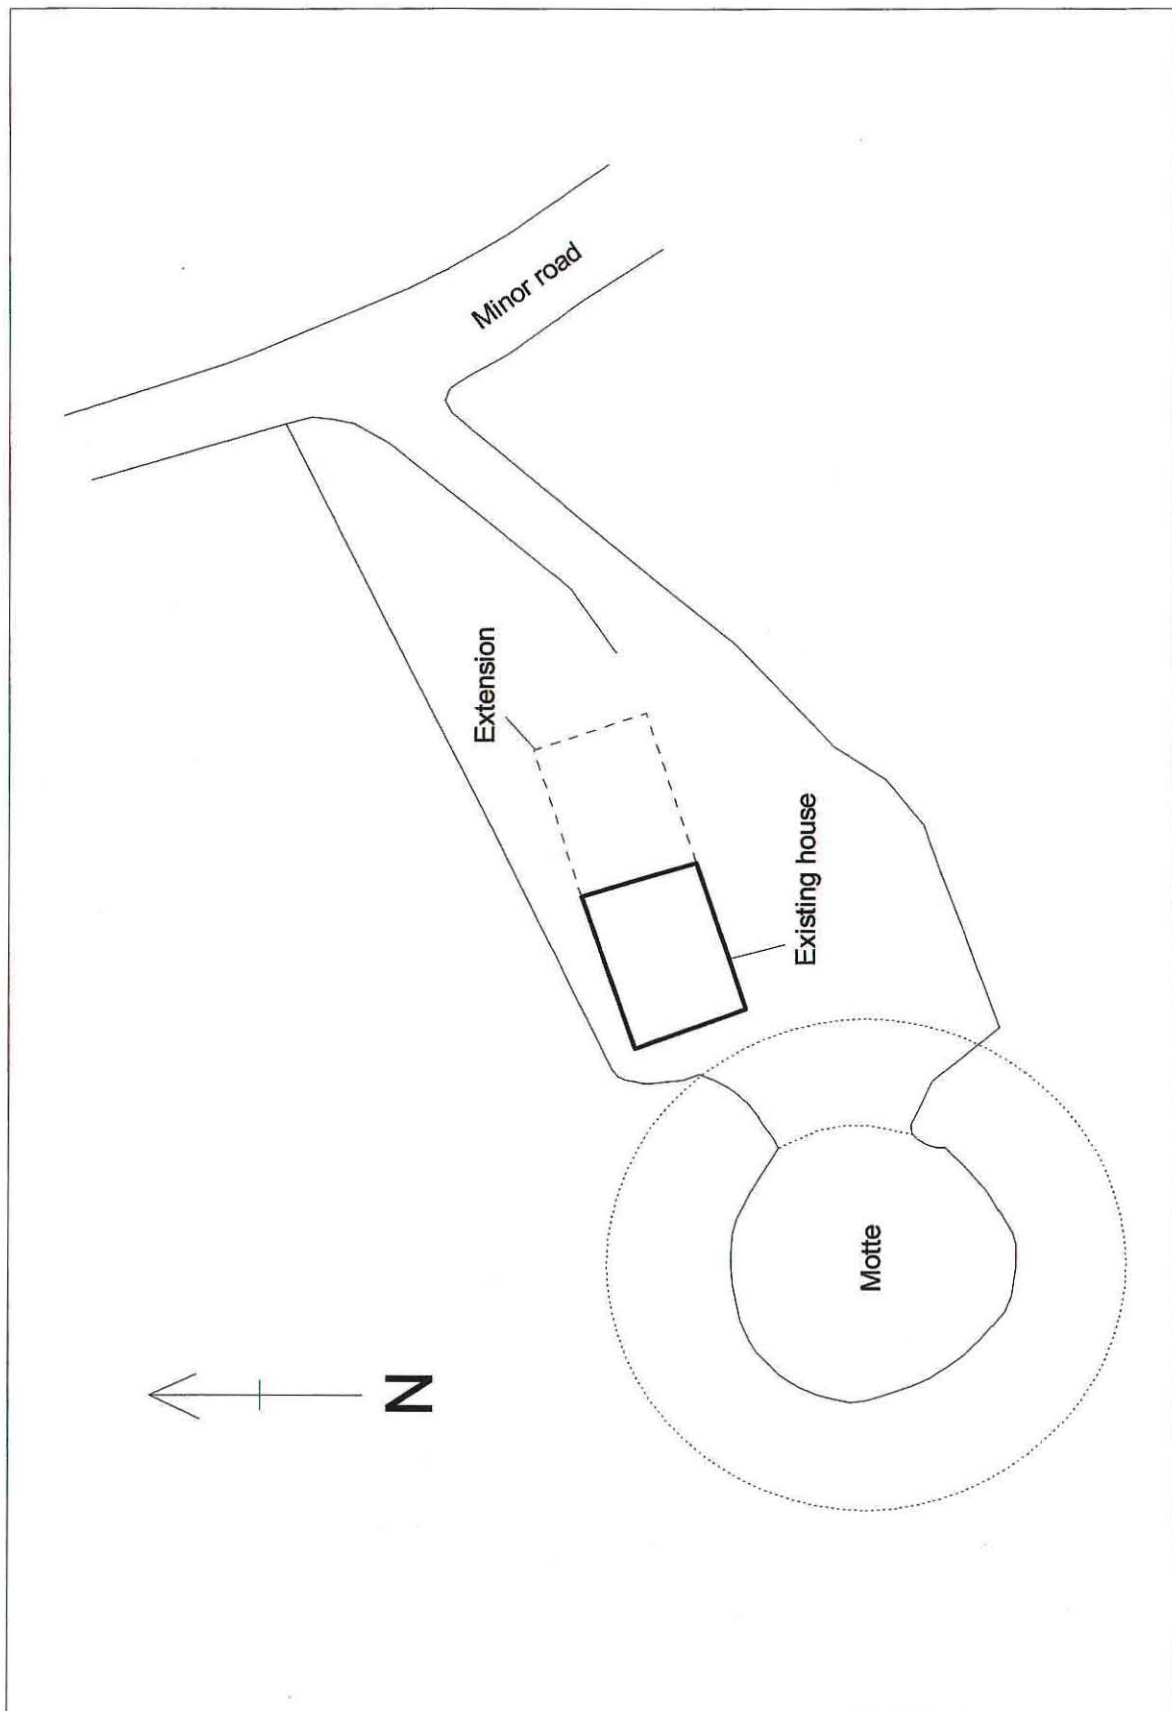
Layout of existing structures and extension (Scale 1:500)
